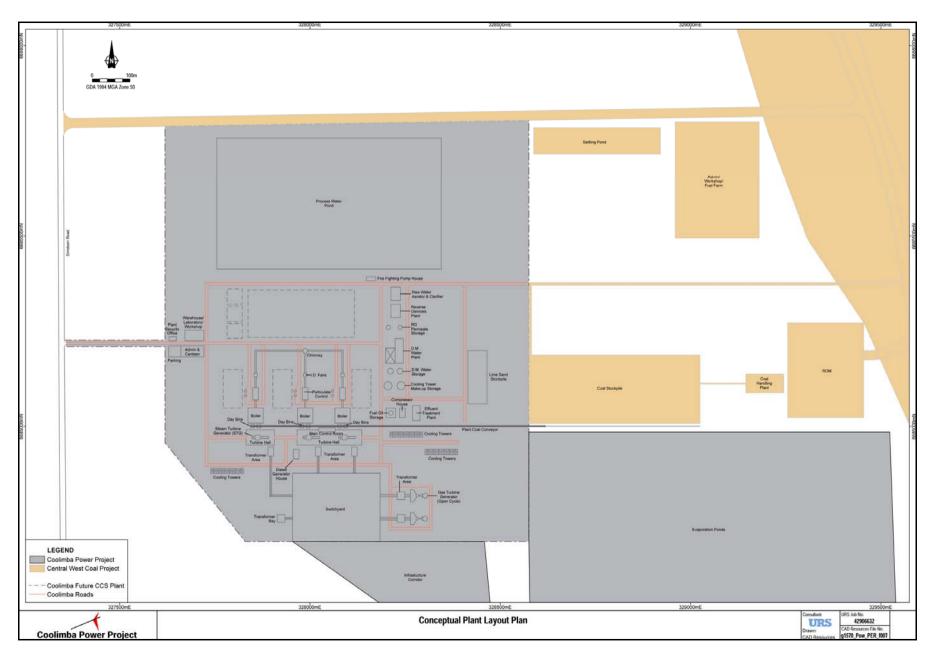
Conceptual power station plant layout plan (Source: Figure 1-4 from URS Australia Pty Ltd, 2009)
